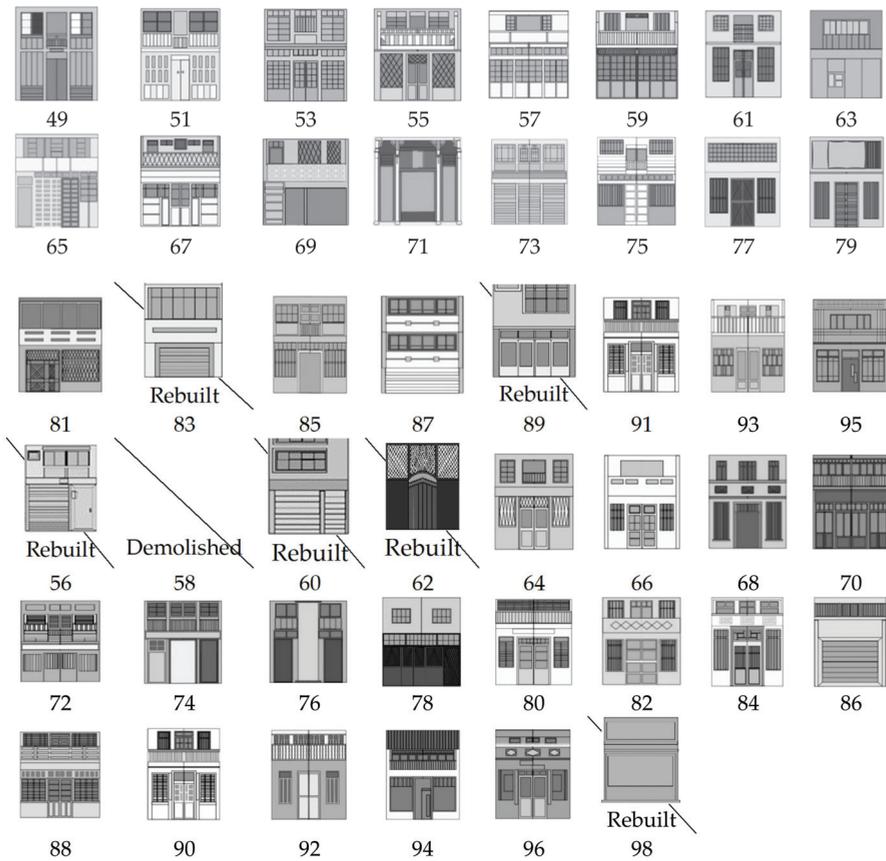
The facade styles of buildings on north and south side. (Adapted from [18]).
